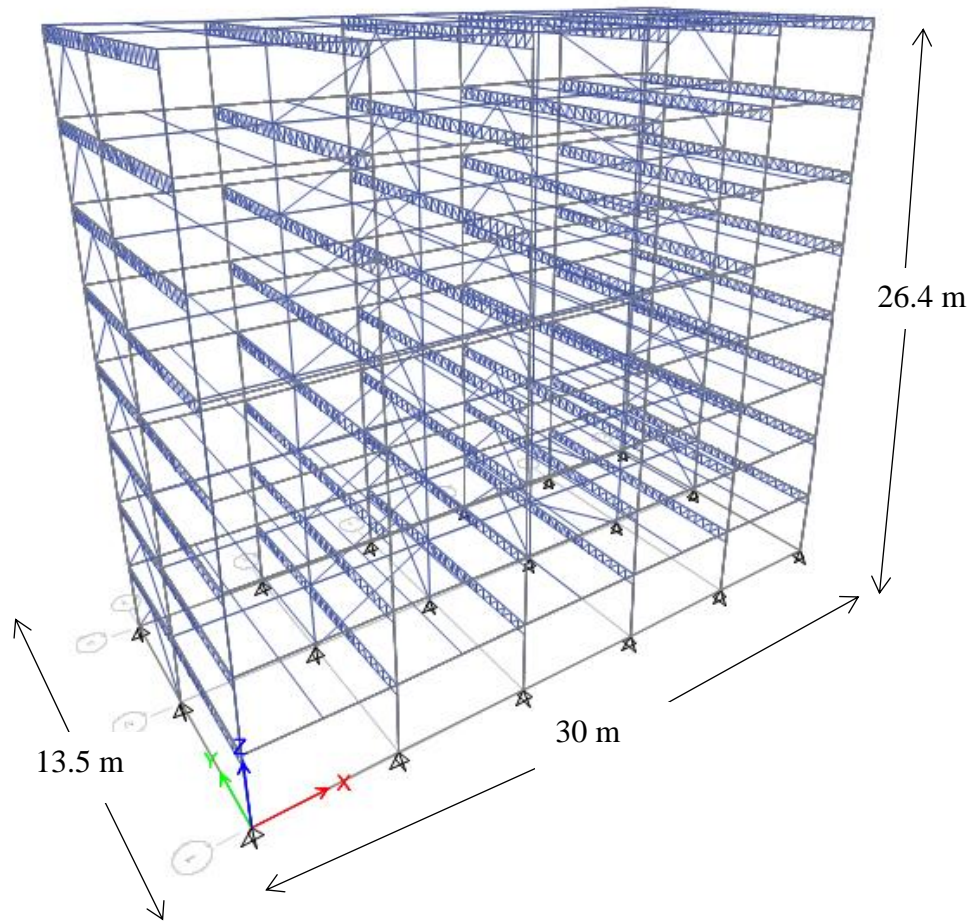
General 3-D view of the dormitory building (RB-T).
